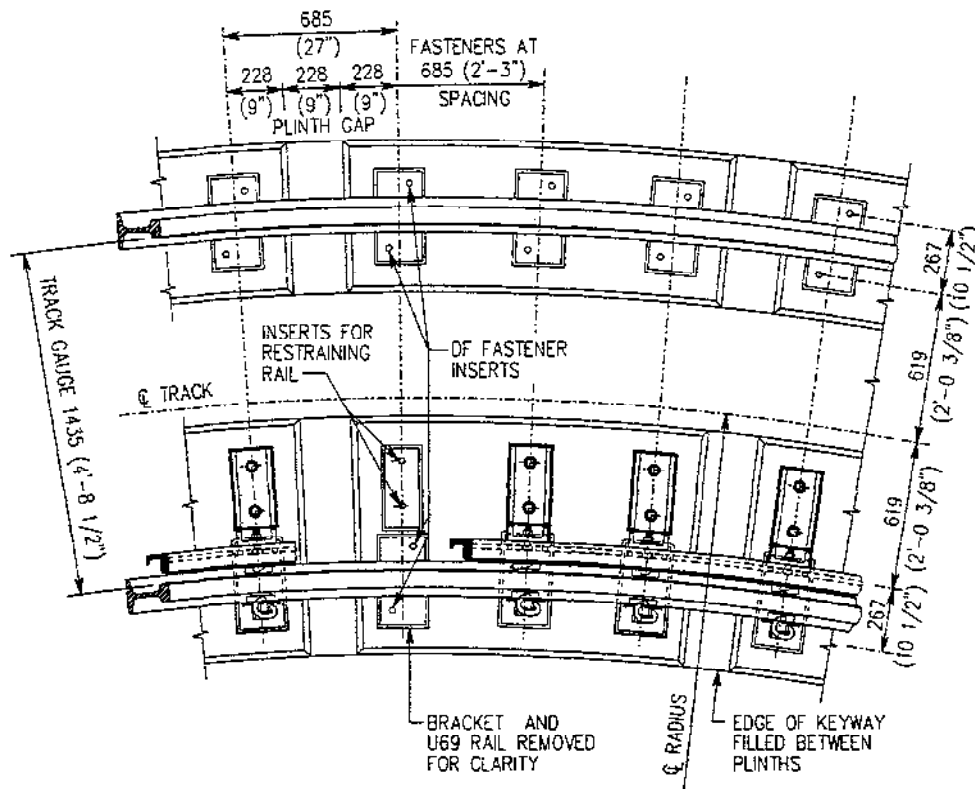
Concrete Plinth Design—Curved Superelevated Guarded Direct Fixation Track with Restraining Rail
